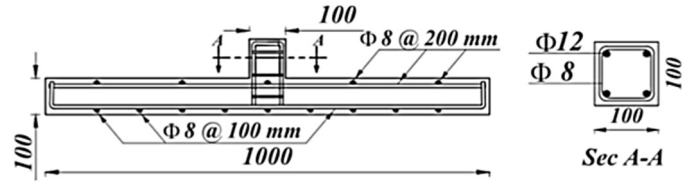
Geometric specifications and reinforcement system configuration in the slab and column of the laboratory model
